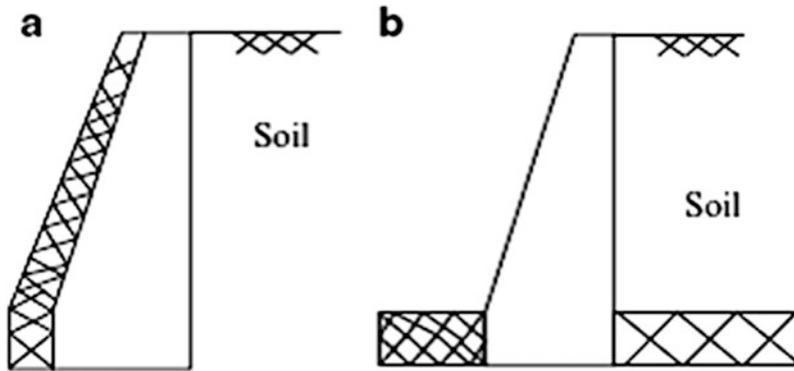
(a) Gravity wall and (b) cantilever retaining wall
